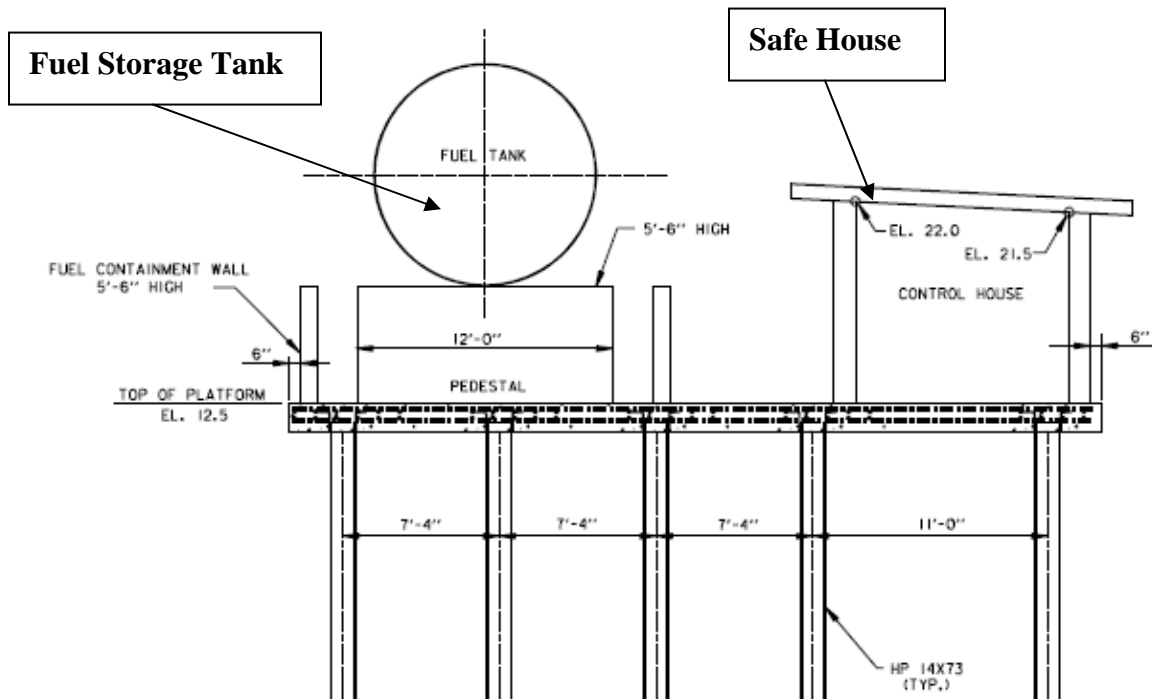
Orleans Avenue Storage Tank and Safe House Cross Section
